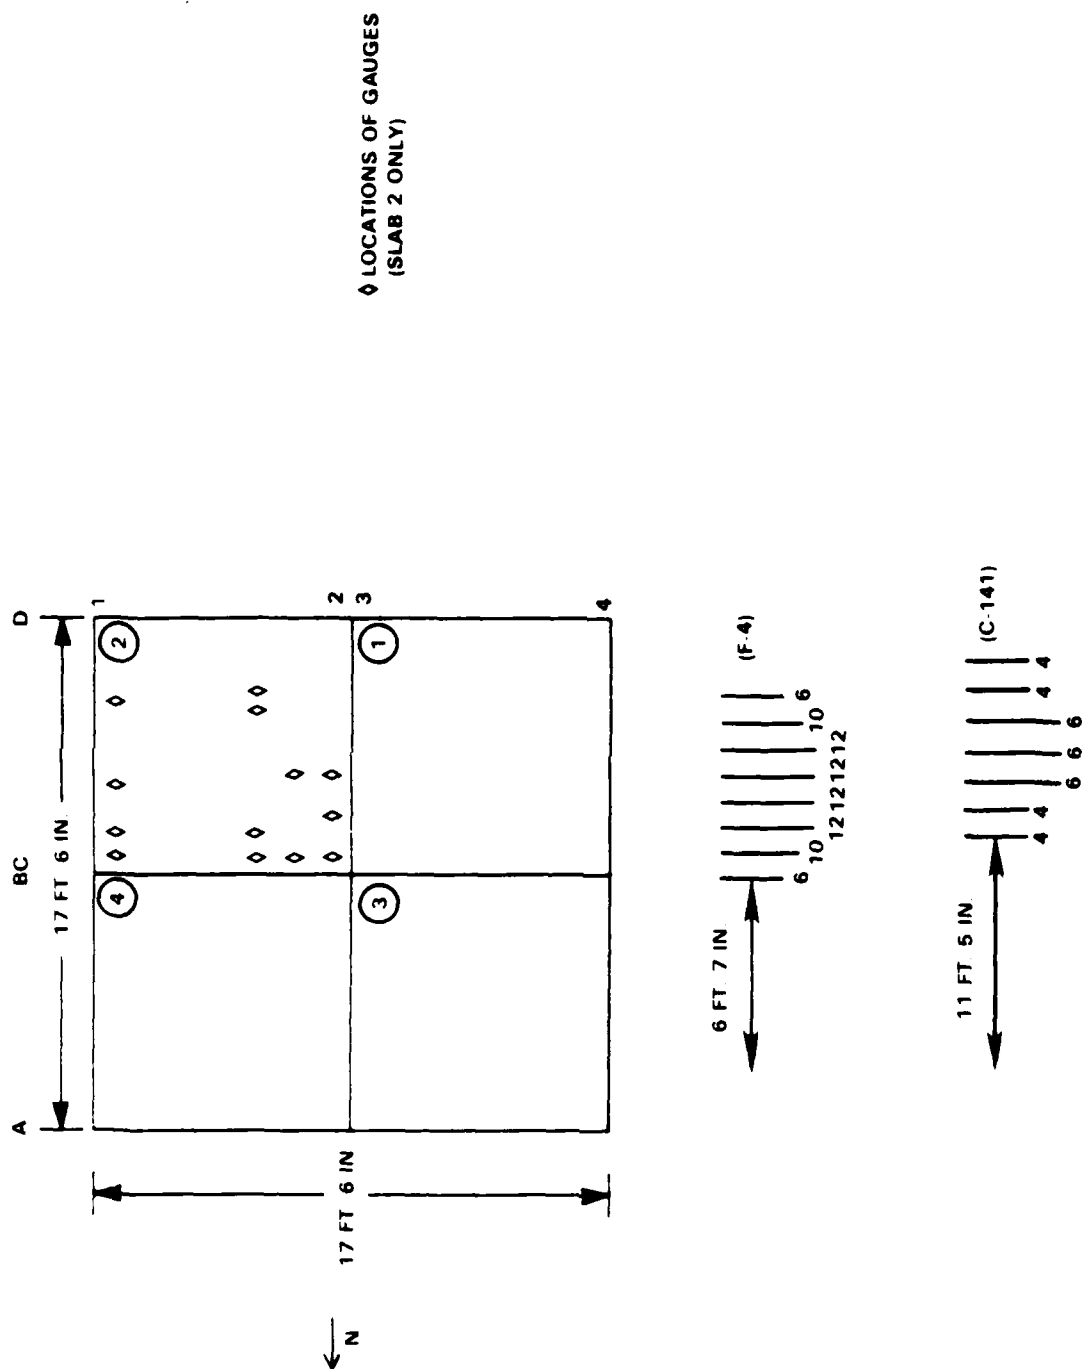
Plan of Test Section, Test 6: 3-Meter Slabs (Uncompacted Ballast Rock Fill over Number 57 Leveling Course).
